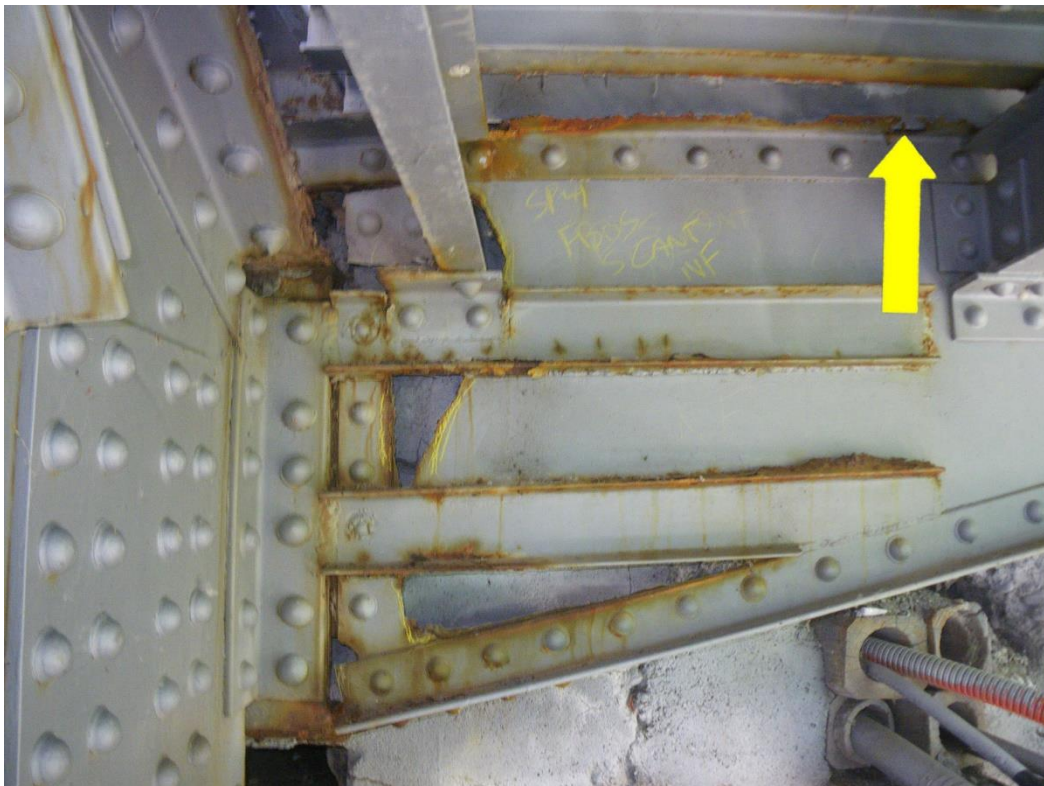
Stringer S10 at Floorbeam FB0S Cantilever, North Face, Span 4 - Not connected to floorbeam web due to 100% section loss of floorbeam web. Note 100% section loss of floorbeam cantilever top flange and repairs.
